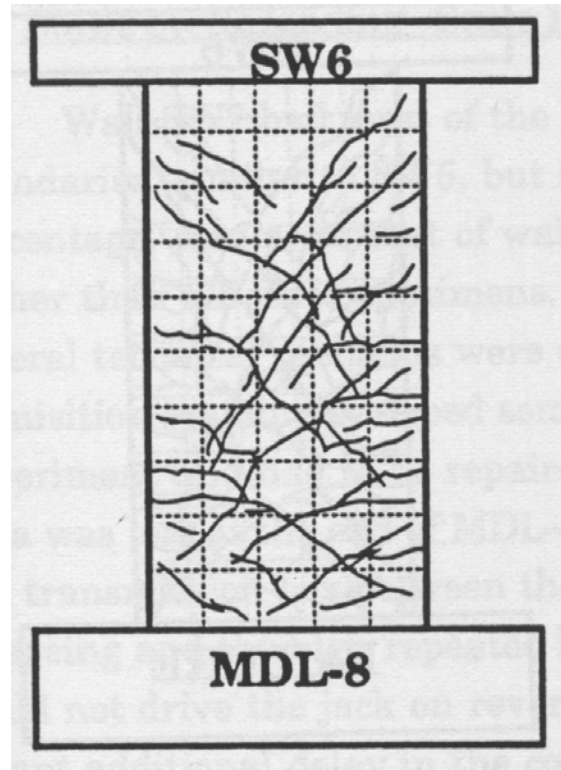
Condition of wall SW6 at 0.67% drift [Pilakoutas (1991)]
